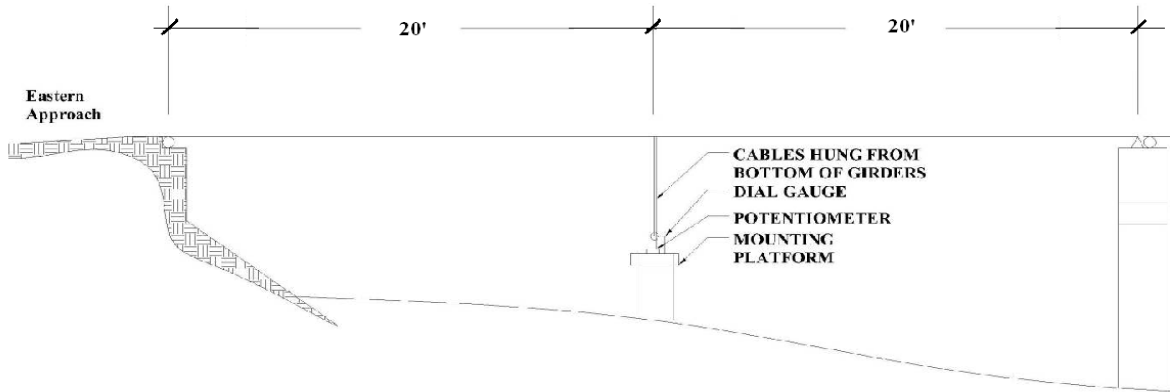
Elevation of Instrumentation Location (not to scale)
